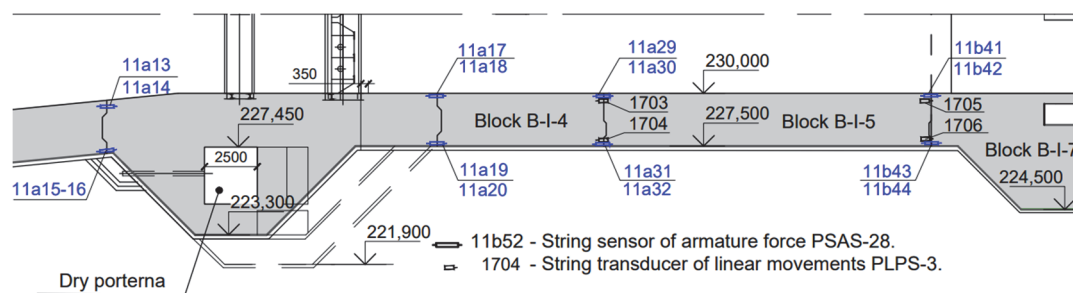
Layout of the instrumentation in the foundation slab, showing the numbers of the concreting blocks
